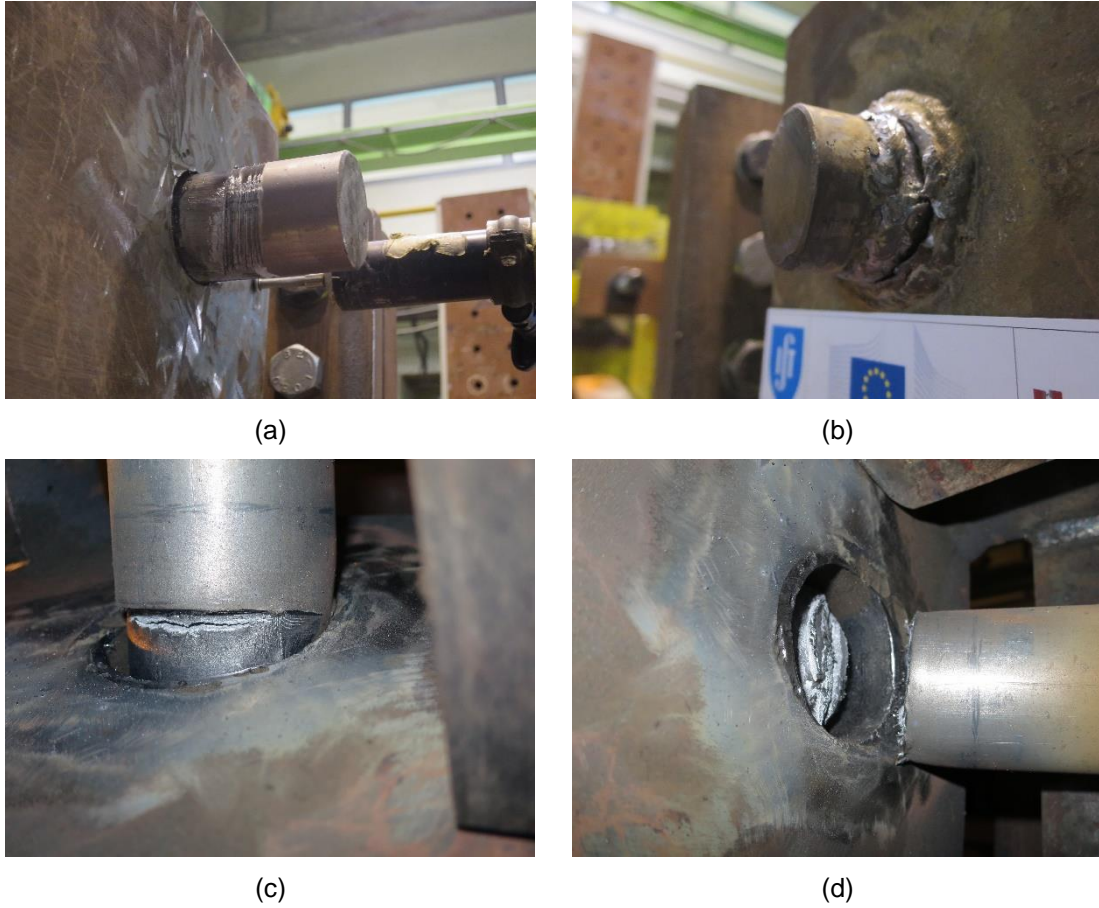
Experimental test 18C: (a) pin elongation, (b) weld failure, (c) & (d) pin failure.
